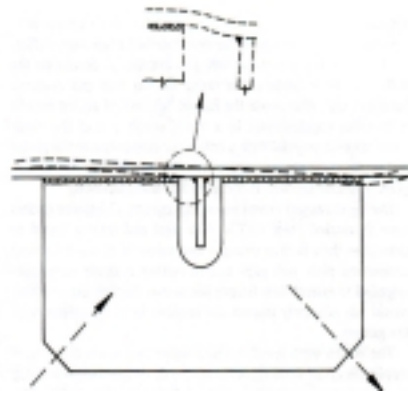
Example of Out-of-plane distortion in web gap at lateral gusset plate
